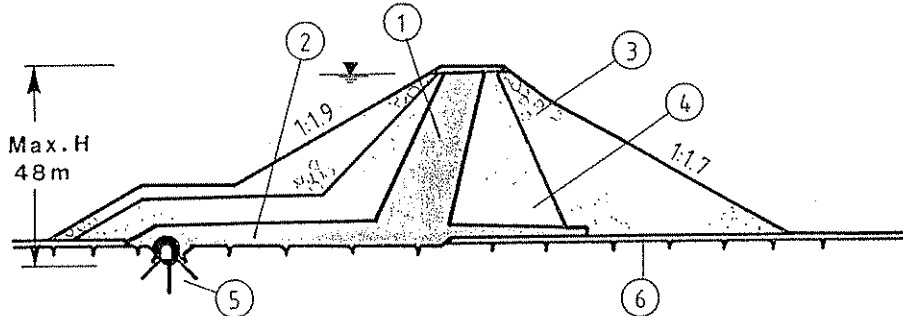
Typical section of a zoned rockfill dam. Example Aabach dam, Germany 1979 (adapted from Idel 1981).
